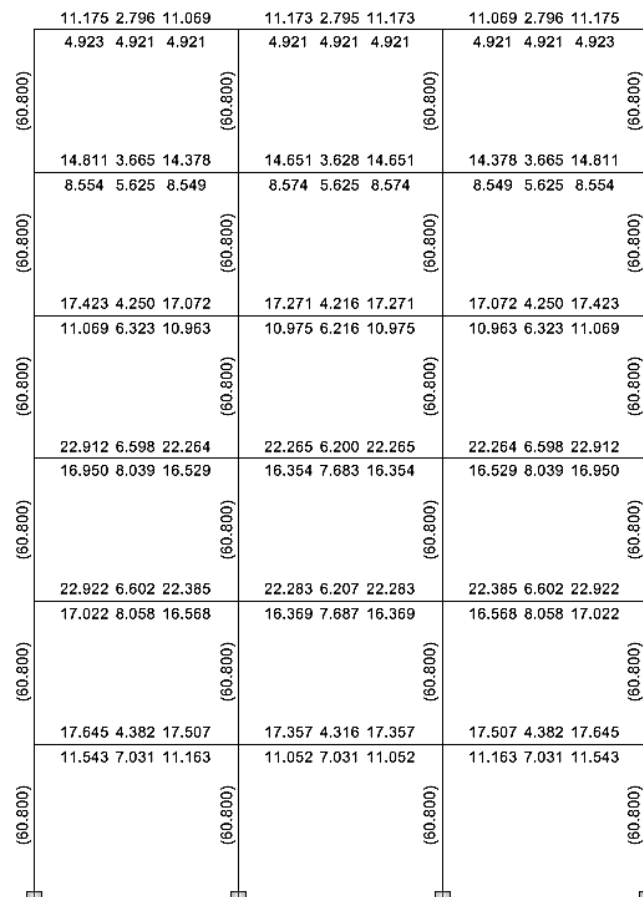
(c) Design longitudinal reinforcement area in a perimeter frame of the 6-story model (cm²)
